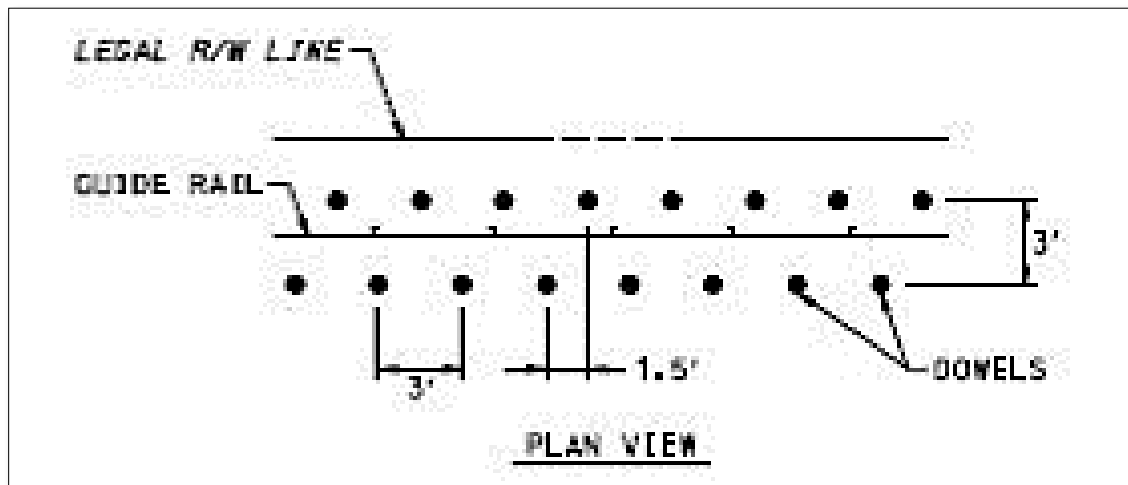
Plan View of Pipe Dowels for Landslide Stabilization
